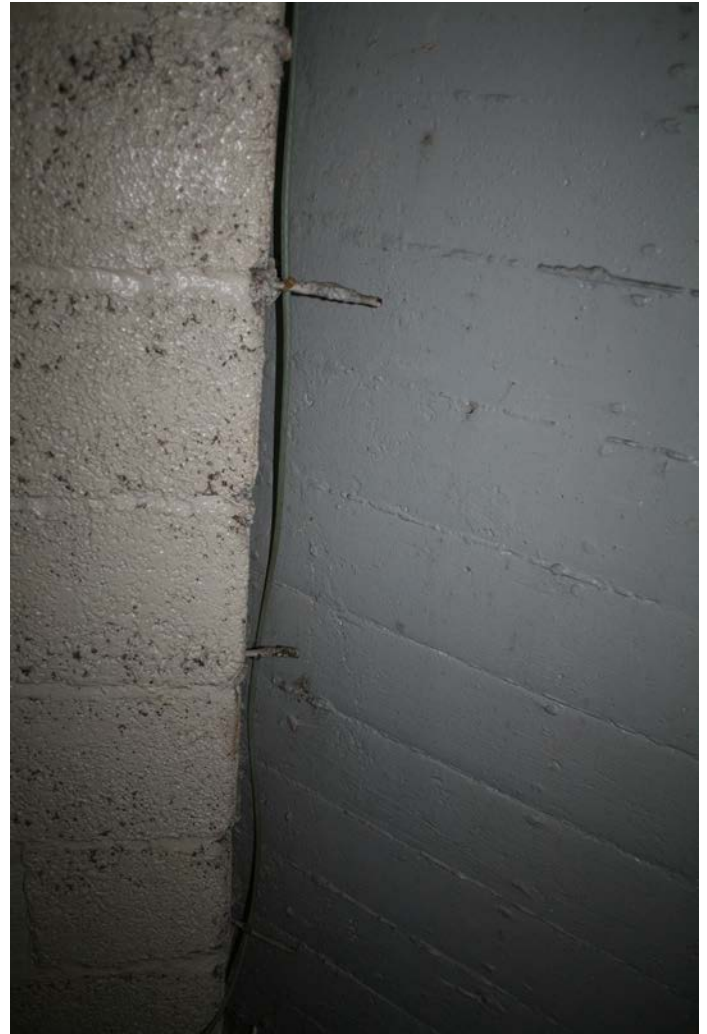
D-21: Horizontal steel reinforcing extending past end of CMU wall at chamfered concrete corner. Lower bar is further inset into CMU than upper bar.
